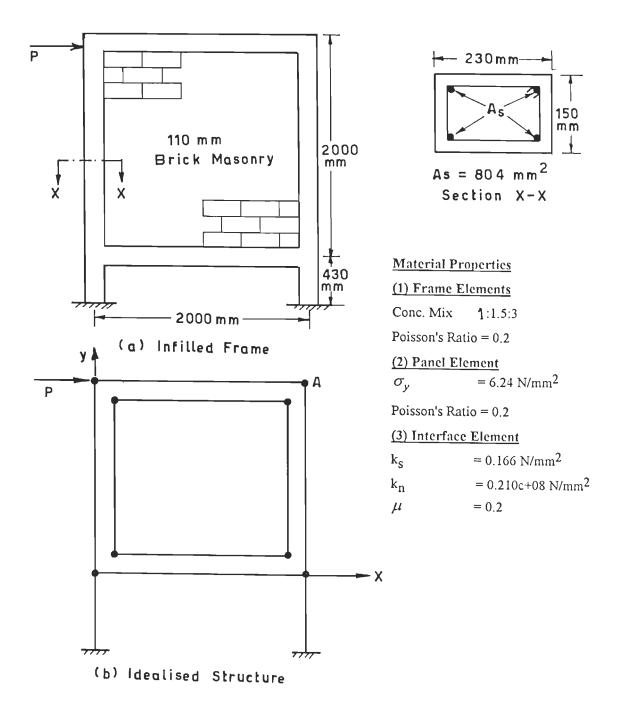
Two Dimensional R.C. Frame with Brick Masonry Panel
